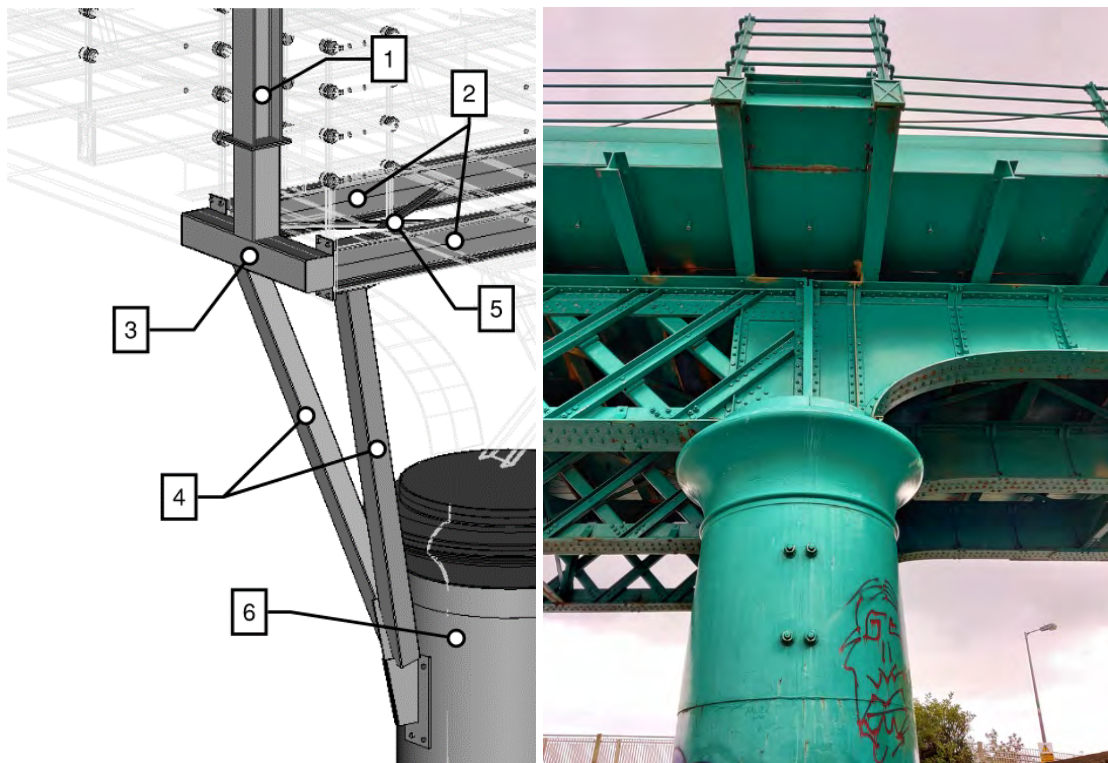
Isometric view of proposed OHLE support alongside view of existing pier.
